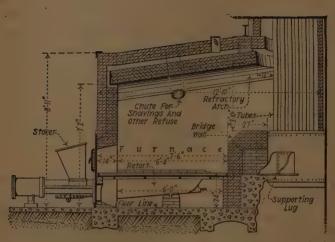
Dutch-oven furnace setting for vertical straight water-tube boiler equipped with Jones underfeed stoker.
